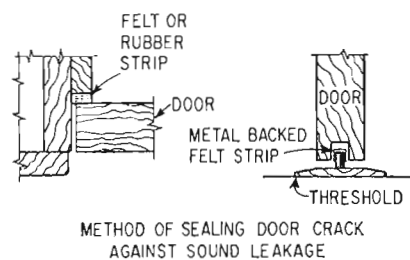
Normal methods for sealing the control-room door. The door itself should be of a heavy type to improve isolation of the control room.
